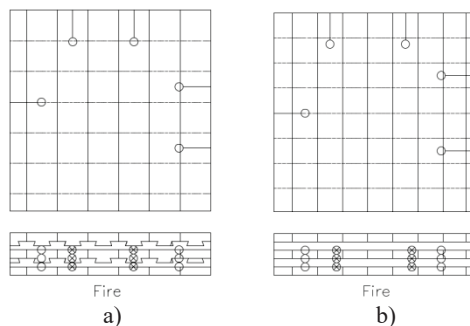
Elevation and cross-section of the CLT specimens and positions of the in-depth thermocouples: a) DMWBE and b) CLT panels.
